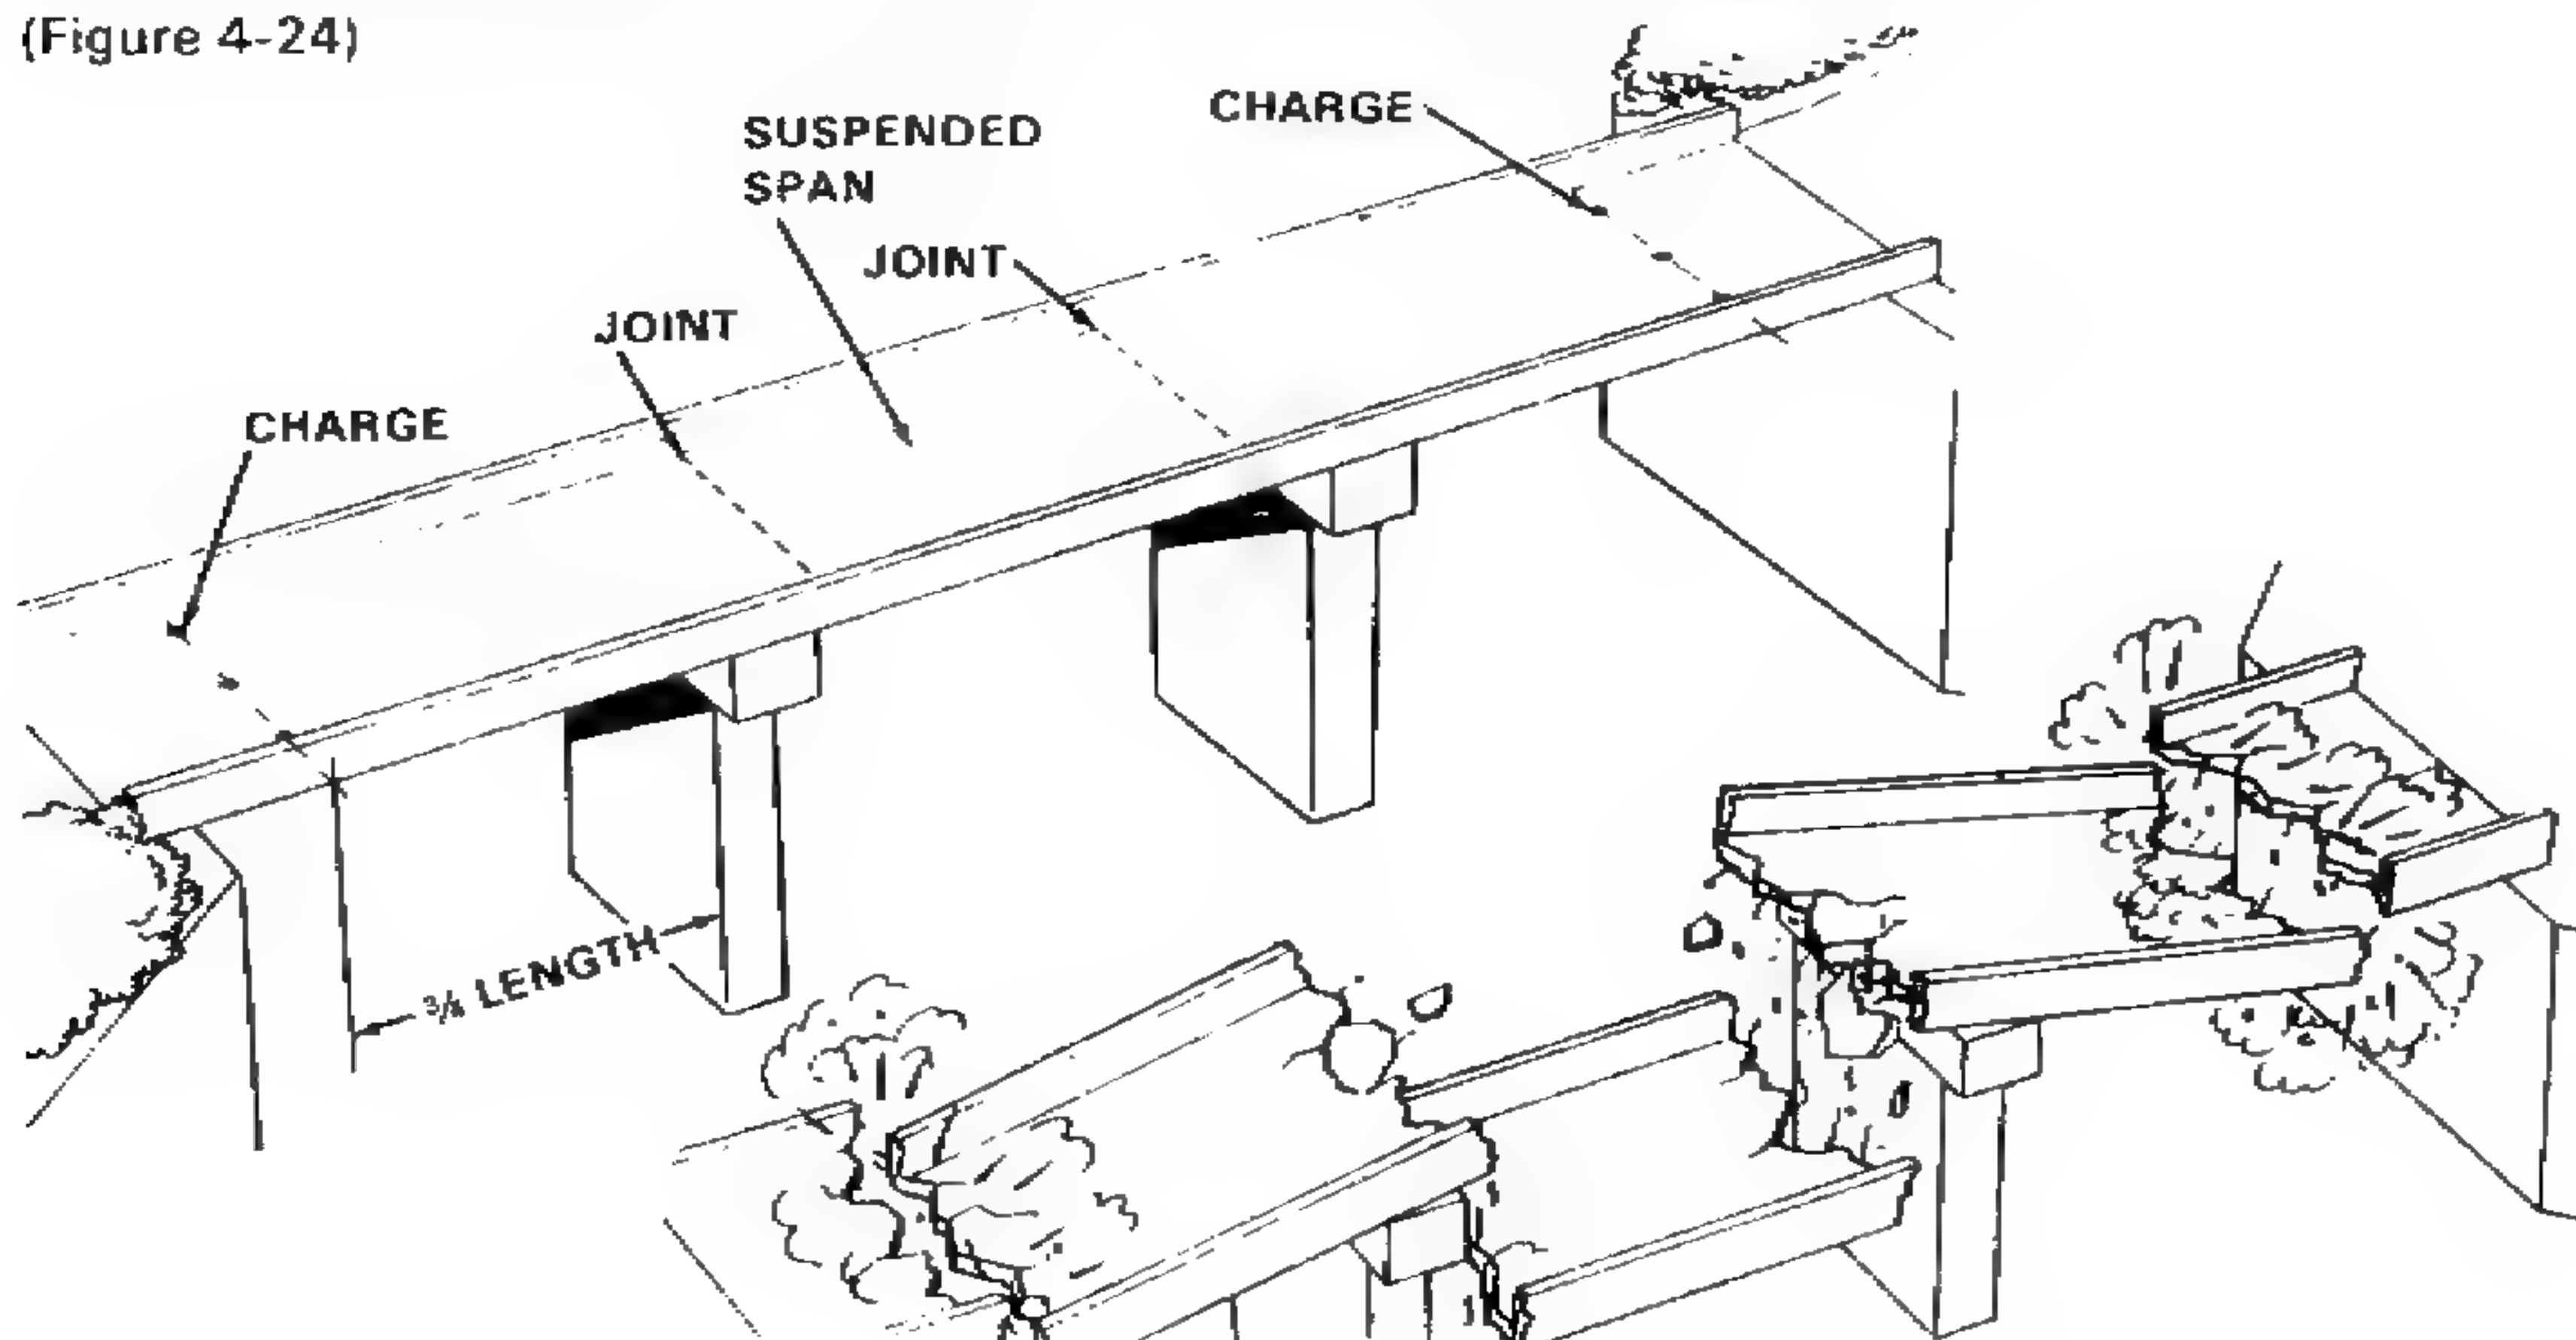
Complete destruction of concrete-slab cantilever bridge with suspended span
